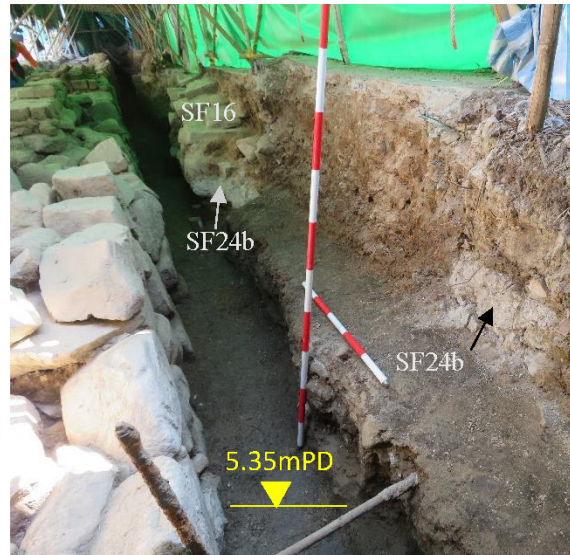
View of moat in Area SE with stone infill [SF16] and concrete footings [SF24 a-b]; looking southeast.
